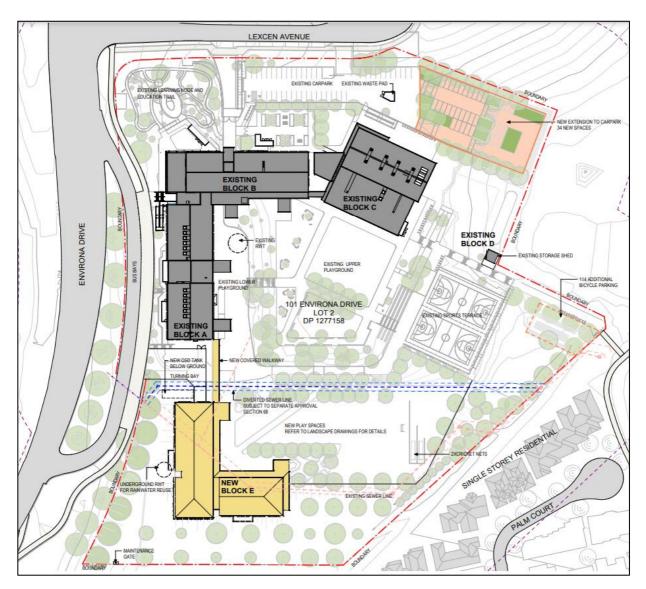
SITE PLAN DEPICTING NEW BUILDING IN YELLOW
